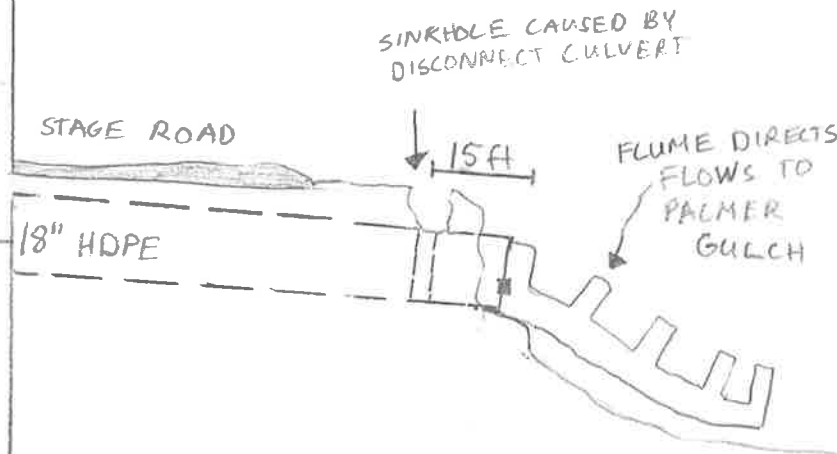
STAGE #1 PROJECT SITE - CULVERT REATTACHMENT
